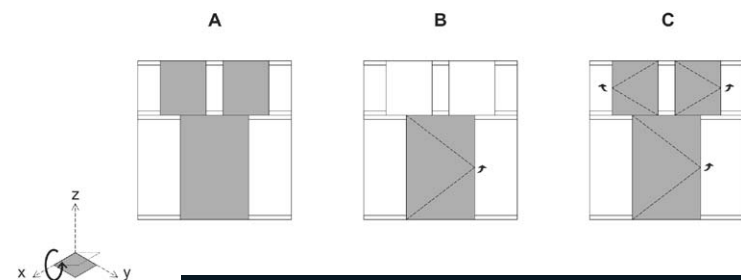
La Caja Mágica sports hall; demonstration of the roof structure rotation around the horizontal axis (A - closed, B - half-open, C - open).
